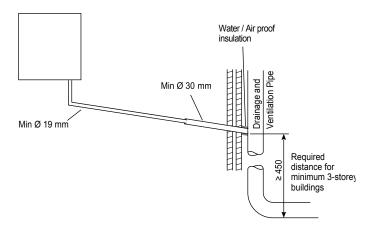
Typical Connection Method of a Condensate Water Drainage Pipe (refer to detailed instructions of the pump manufacturer)
